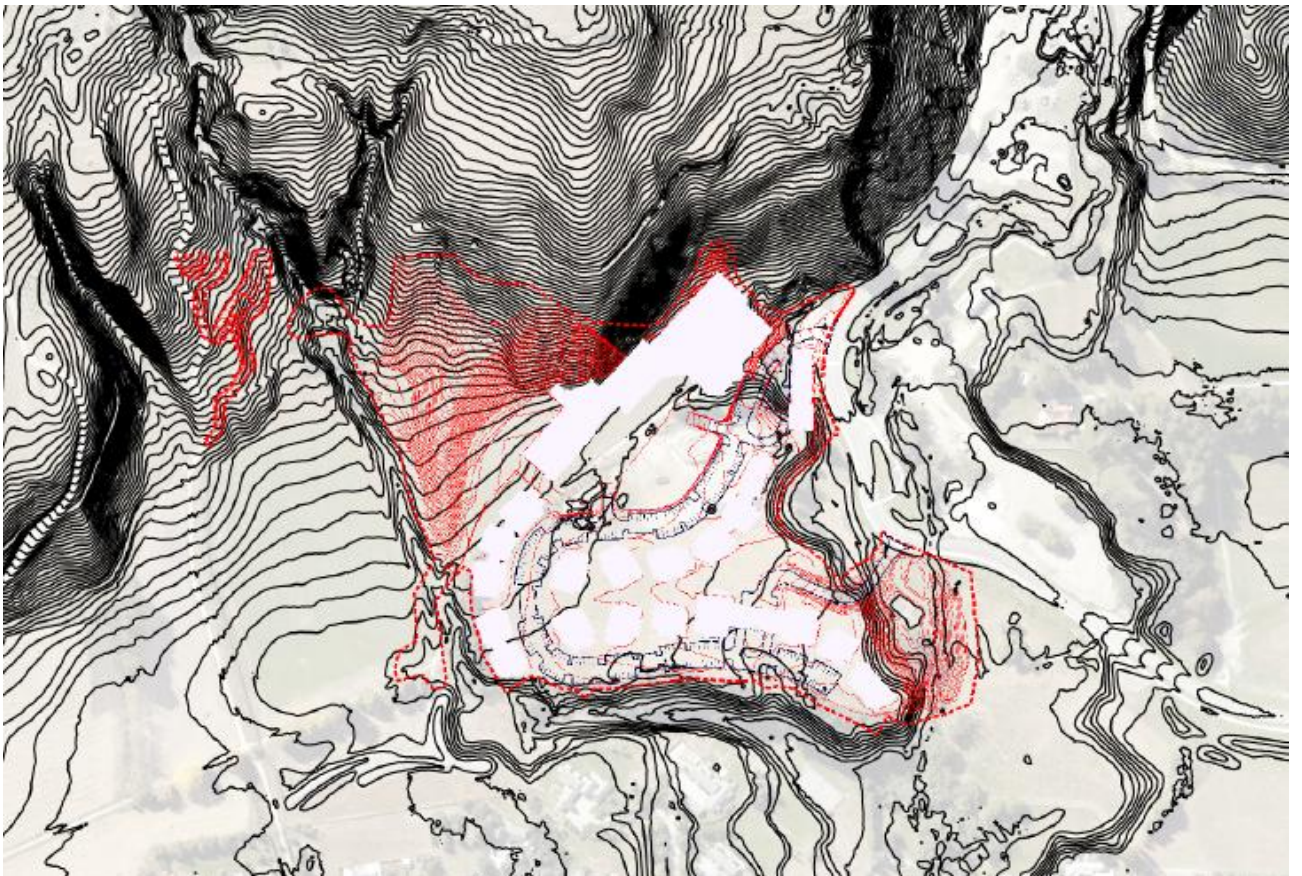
Appendix 20 Proposed Contour Overlay Plan (red linework) overlaid on Existing Contours (black linework). Zoomed in so that the proposed earthworks are more legible.
